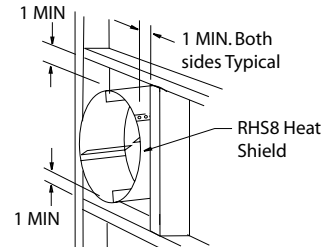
RHS8 heat shield installed by sliding over the vent pipe where it passes through combustible construction.
